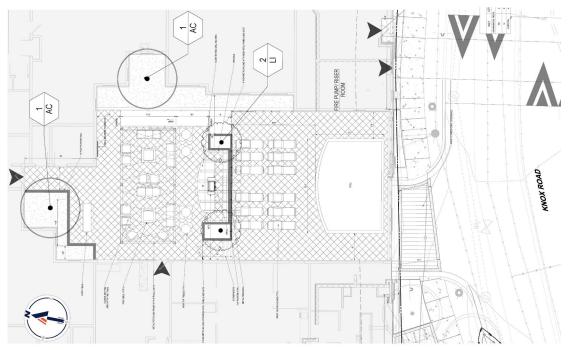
Level 2 floor plan with pool and roof deck (Building 1)
